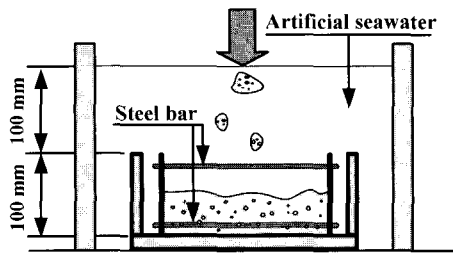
The manufacture method of steel bar reinforced antiwashout underwater concrete
